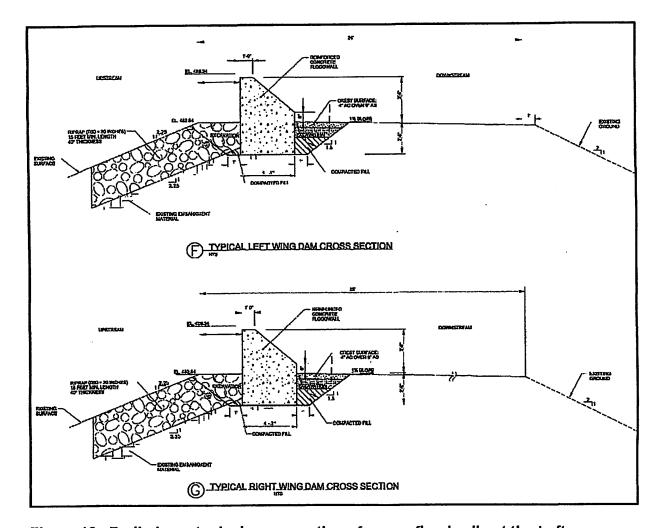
Preliminary typical cross sections for new floodwalls at the Left Wing Dam and the Right Wing Dam.
